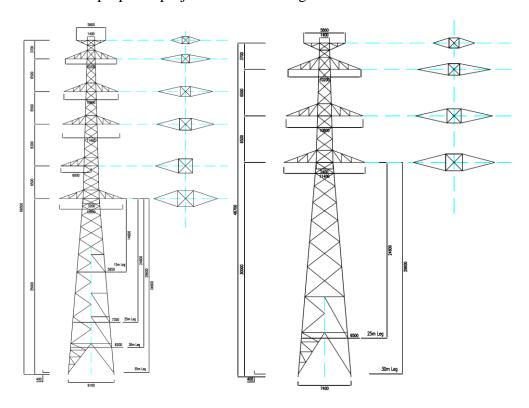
Example of tower to be used for the proposed project (Left: 3cct and Right: 2cct Source: JICA Preparatory Survey Team, 2020
